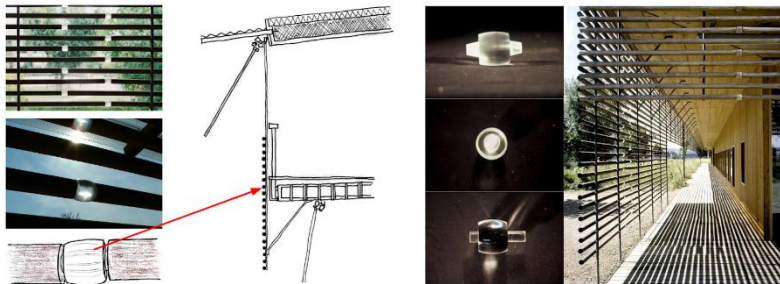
Plexiglass (Source: Arquitectura Viva, detailed section drawn by author)
